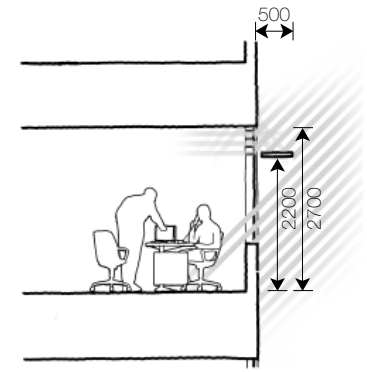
Type 3 Curtain wall with shading shelf and light redirecting panel
